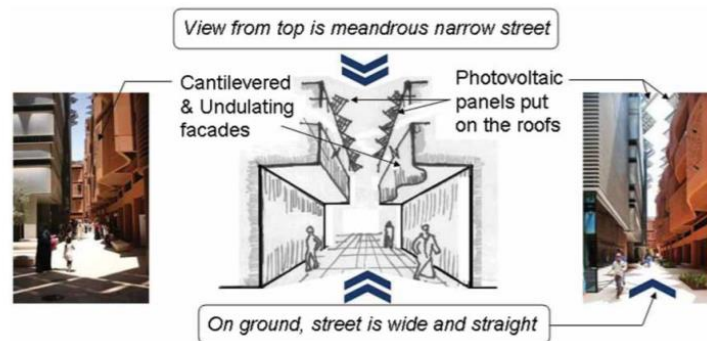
The streets have been designed as wide and straight on the ground. If we look from a bird's eye view towards the streets, we would find them twisting and narrow due to prominent cantilevers, undulating facades and photovoltaic panels fixed on the roofs. The Masdar planners achieved shaded areas without compromising the movement of pedestrians or light motorized vehicles.
